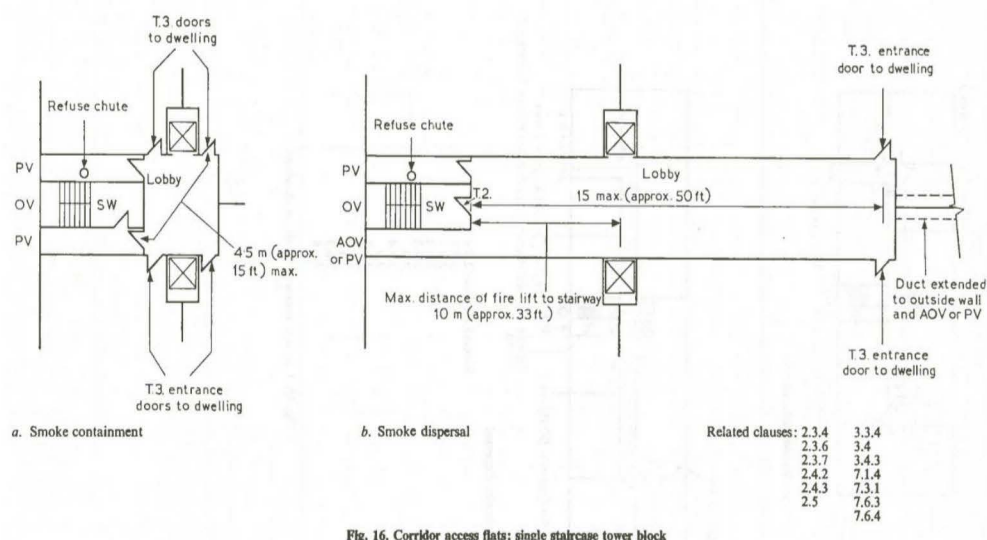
CP3 1971 Figure 16 - Corridor access flats: single stair tower block
